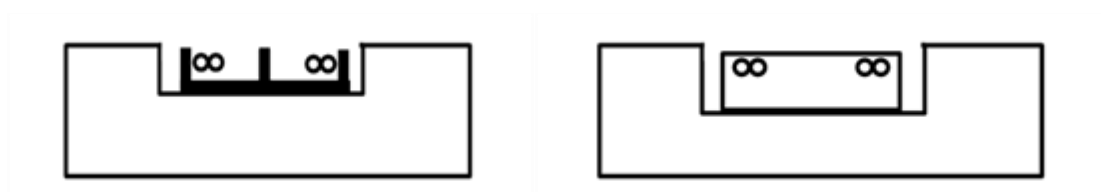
Trench construction of KAIST system: (left) In-situ construction (right) Pre-fabricated system.
